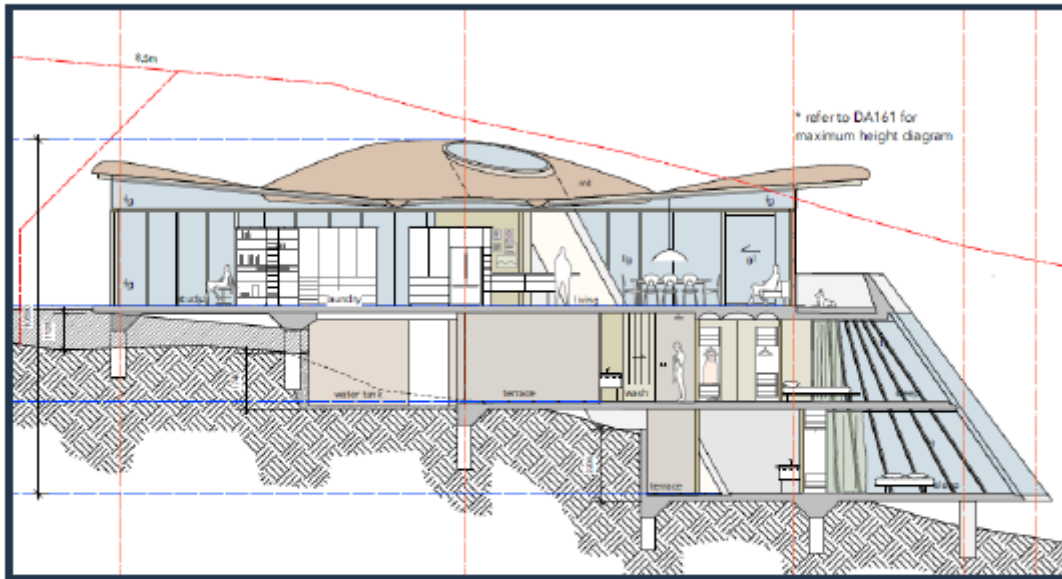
Section demonstrating the exceedance of the building height control applying to the proposed dwelling (Source: Peter Stutchbury Architecture)
